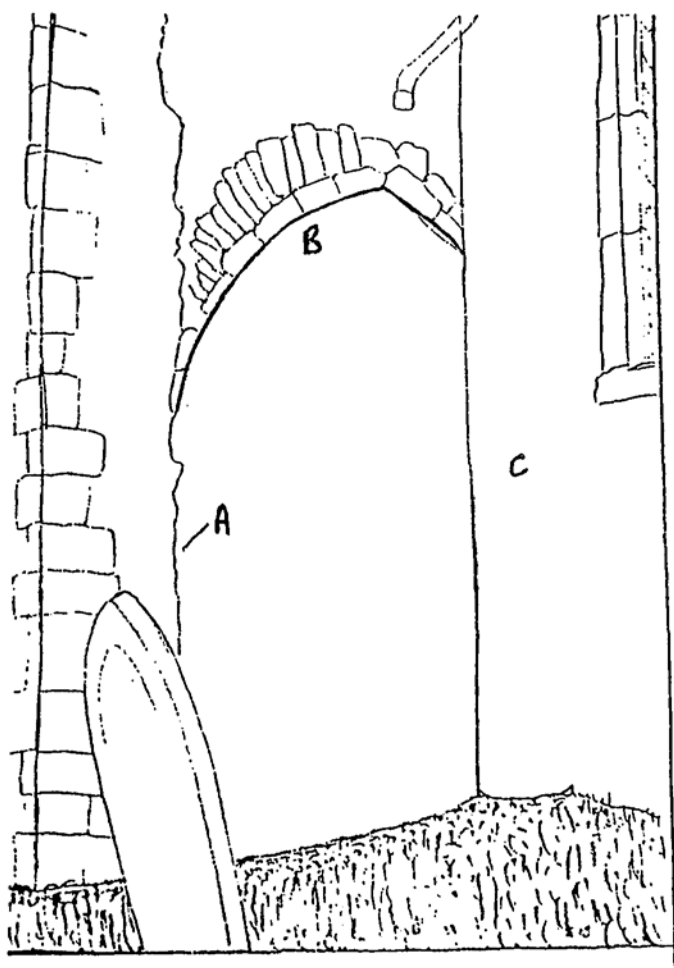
Outer north wall of chancel (East of North Chapel). A. Line of re-built east chancel wall (19th century). B. Closed-in arch. C. Late fifteenth- early sixteenth-century east wall of North Chapel.
